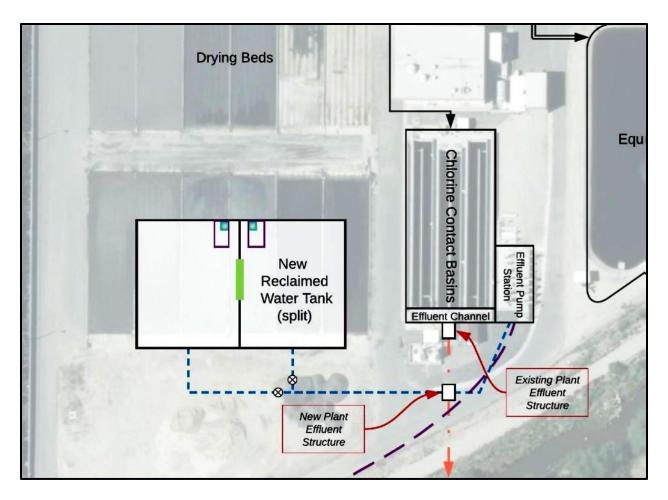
Proposed Site Plan – Southwestern Corner of Existing WRP, Camarillo.
